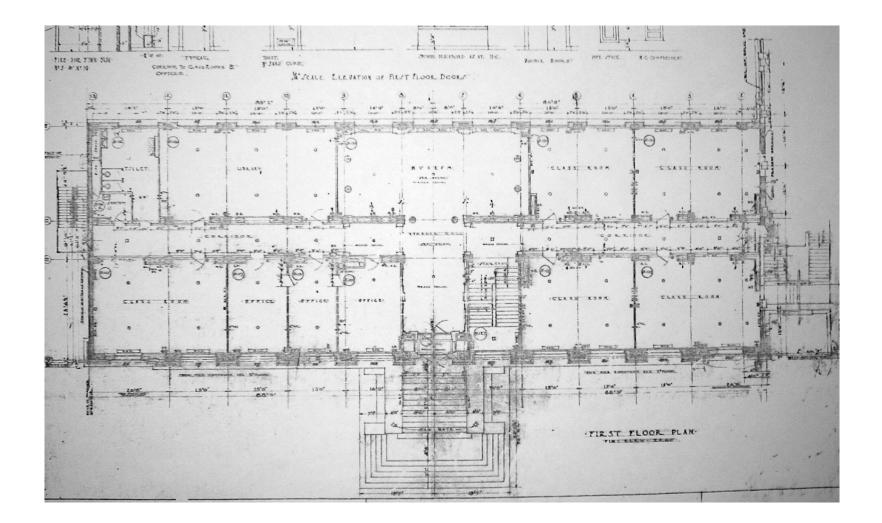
Photo of the First Floor Plan of the Pratt School of Naval Architecture.
